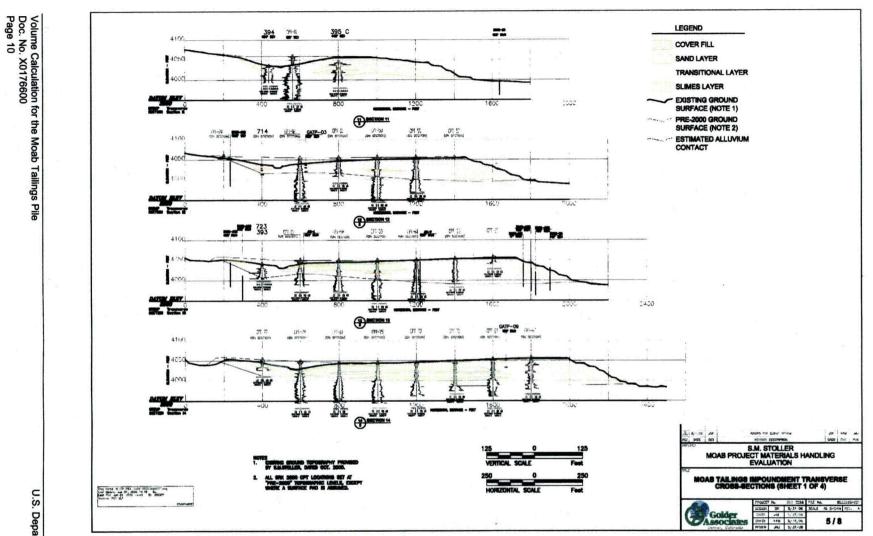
Moab Tailings Impoundment Transverse Cross Sections (Sheet 1 of 4)
